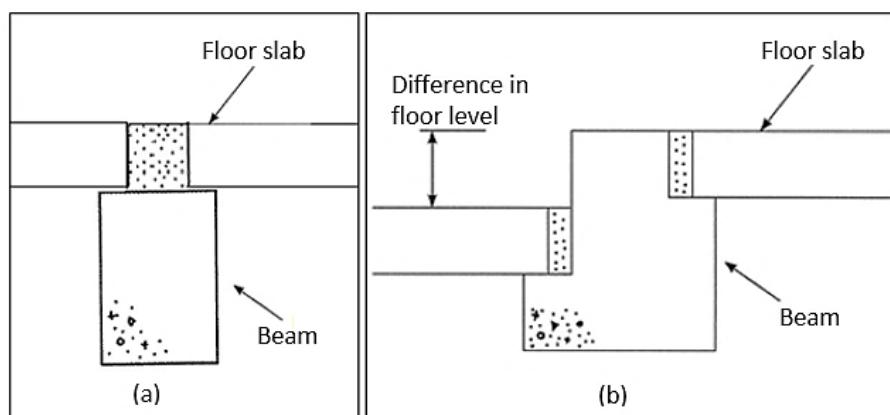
Internal beam (Inverted T beam) (Elliott, 2002)
